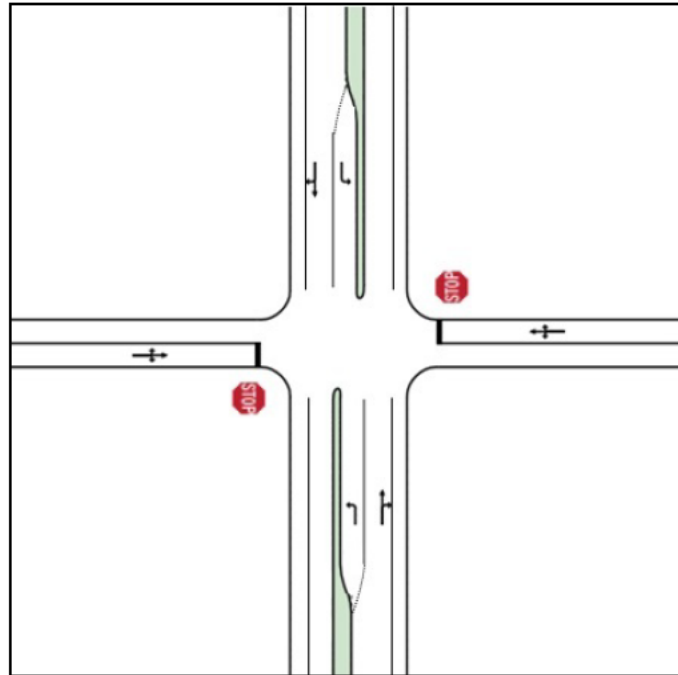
Left turn lane concept for church site driveway to the east and proposed residential development to the west.
